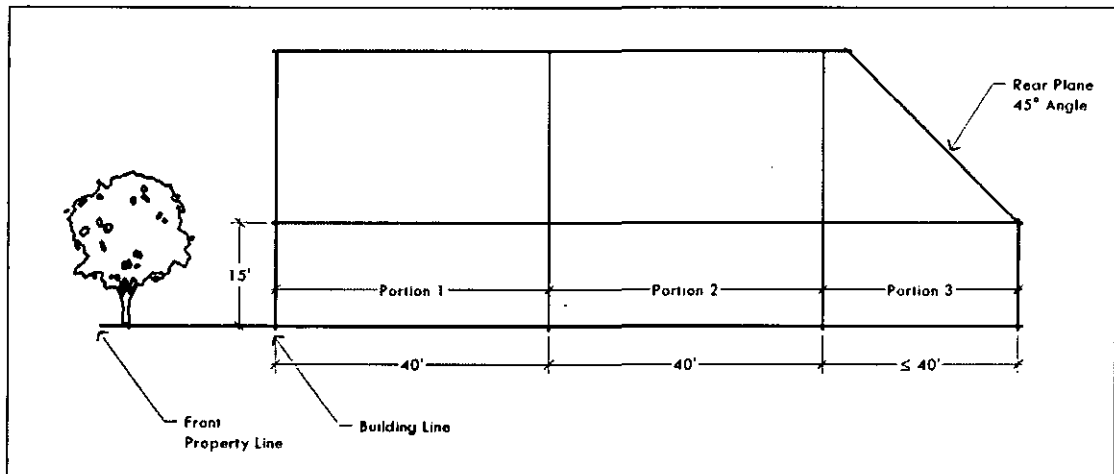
(Elevation View) Rear Setback Plane (Level Ground)
